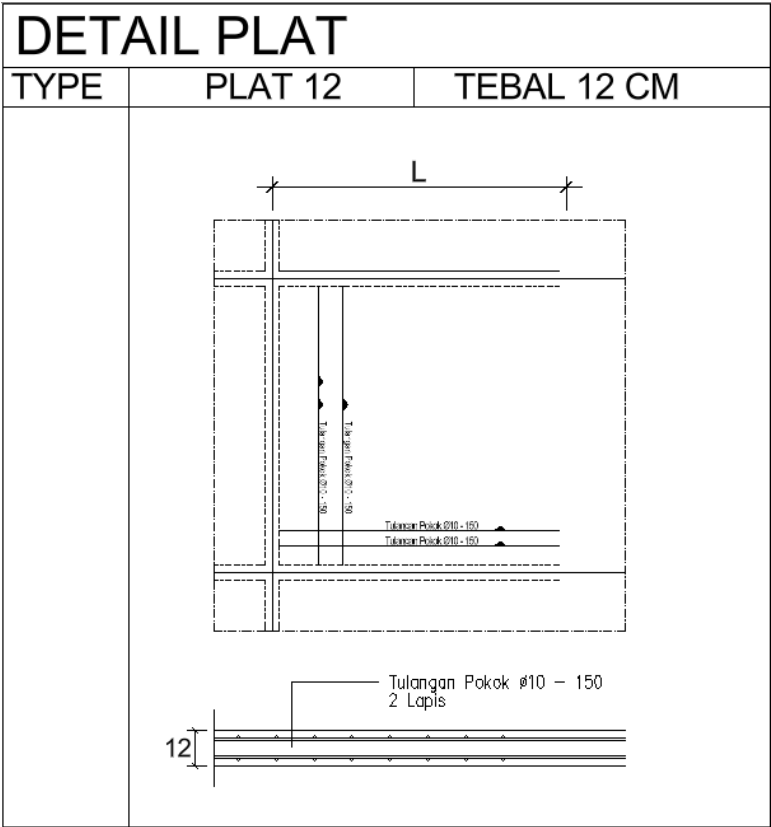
Slab Reinforcement Detail of Griya Kos Diponegoro
